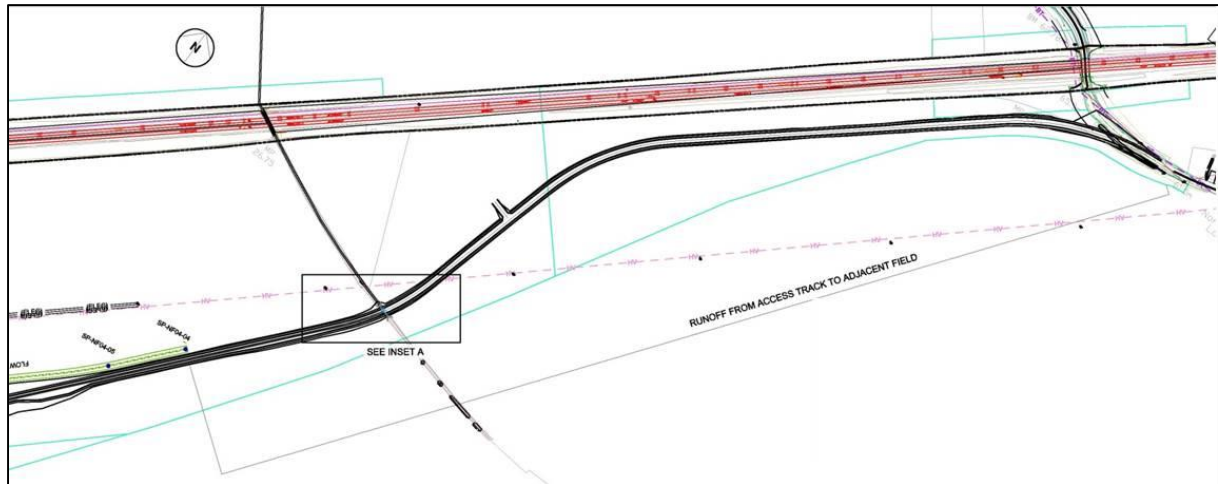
Eastern Section of the Access Track with no Formal Drainage Network and Surface Water Allowed to Runoff onto Adjacent Farmland and allowed to Infiltrate at Natural Rates.
